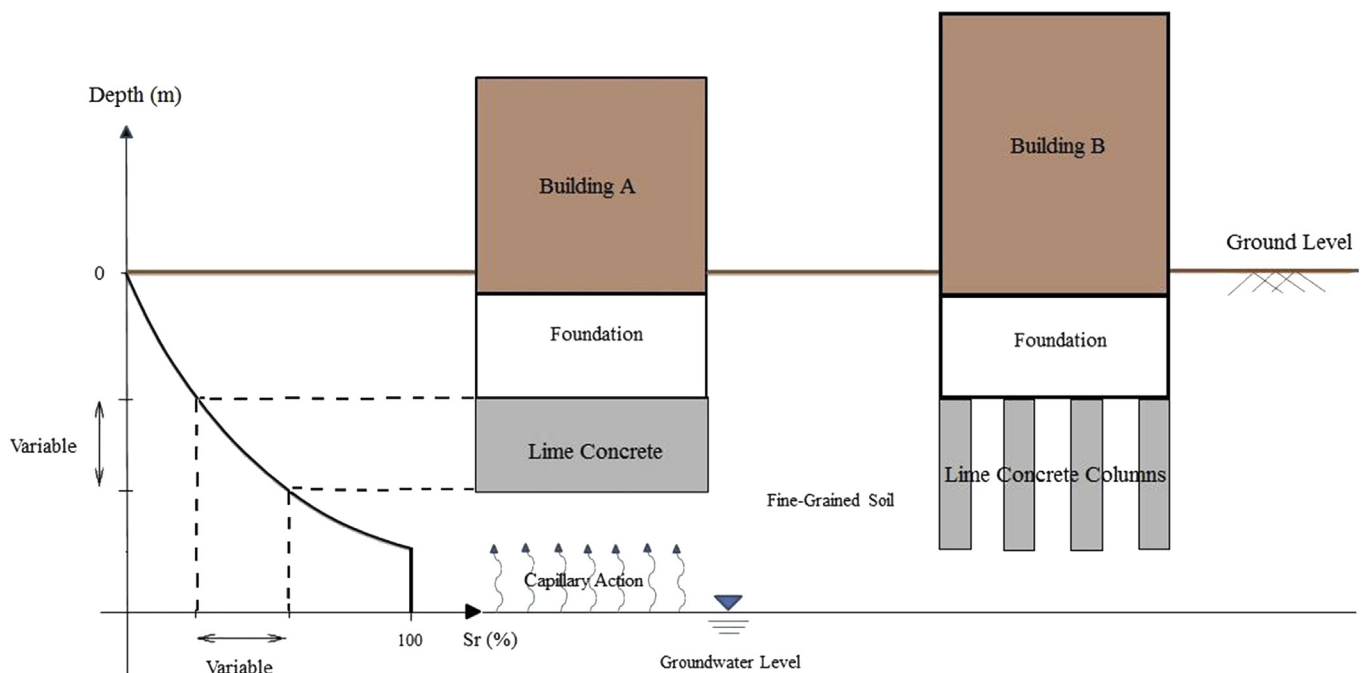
A sketch of two buildings constructed over lime concrete and the effect of capillary action.
